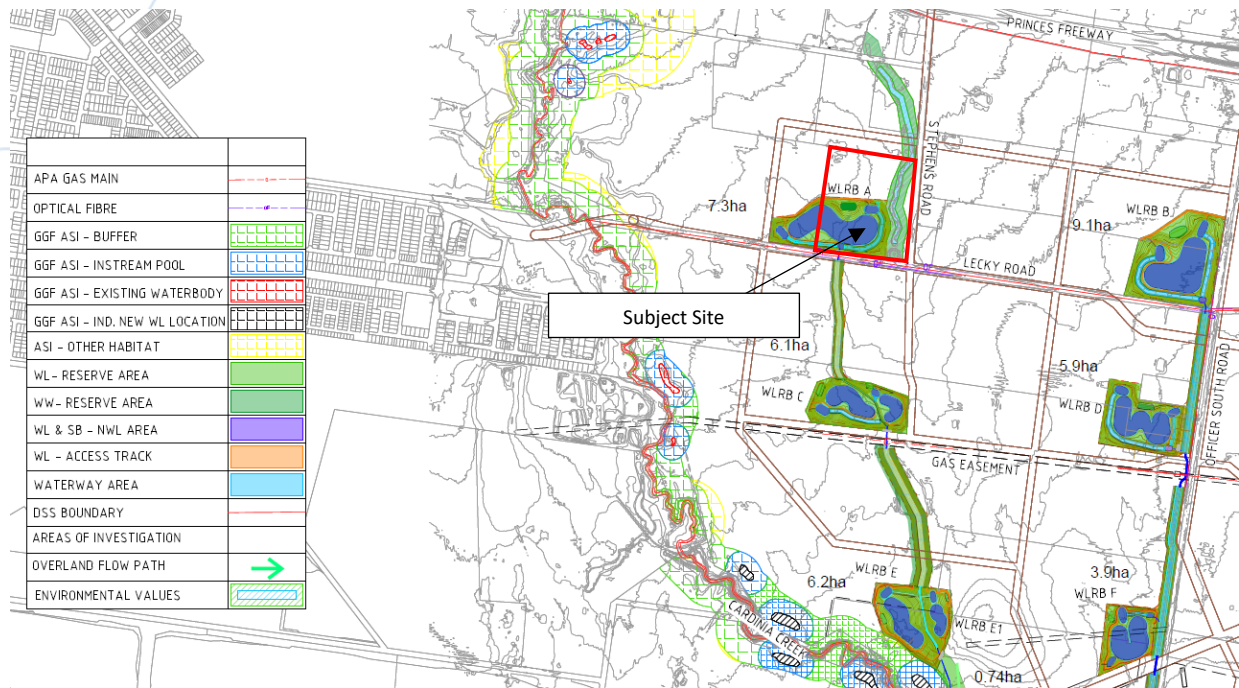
EXTRACT OF DSS ASSET OVERVIEW PLAN (MW)
